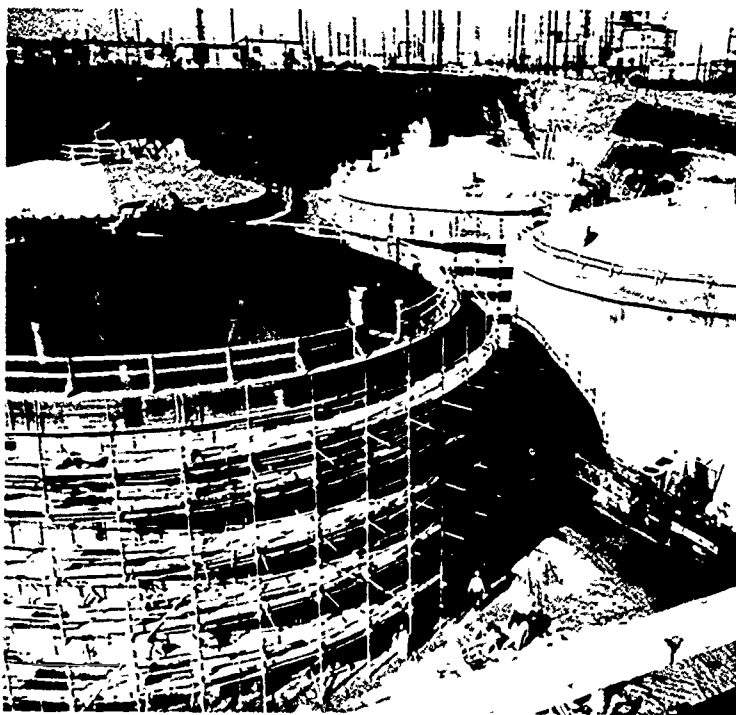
Large concrete-encased steel tanks under construction at the Savannah River Plant will store high-level wastes. Note forms for prestressing concrete on unfinished tank at left, finished tanks at right, and size of man in center foreground. There are now 80 million gallons of high-activity liquid wastes stored in AEC facilities.
